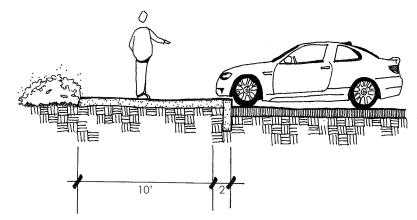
Parking Lot Curb - 6" Curb Adjacent Primary Pedestrian Walk
